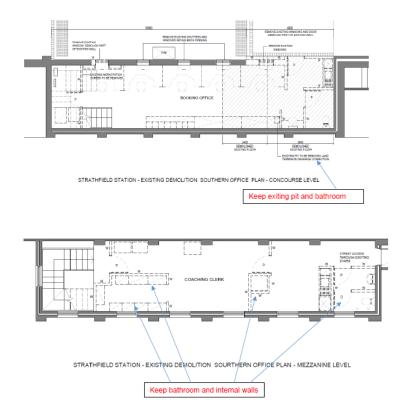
existing and proposed layout plan, Ex-SouthernTicket Office
